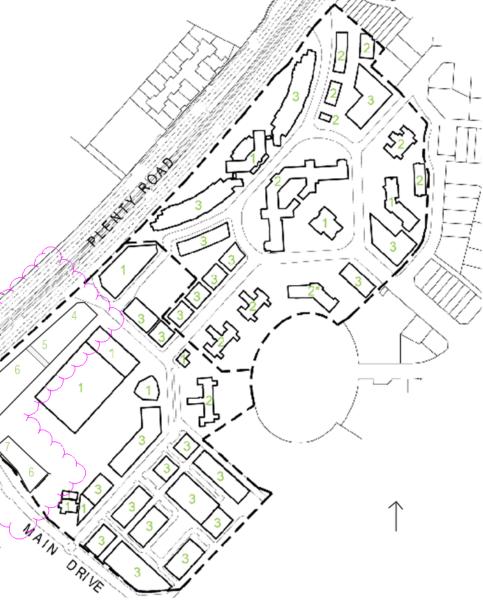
Indicative Conceptual Building Heights above ground (ie storeys)
